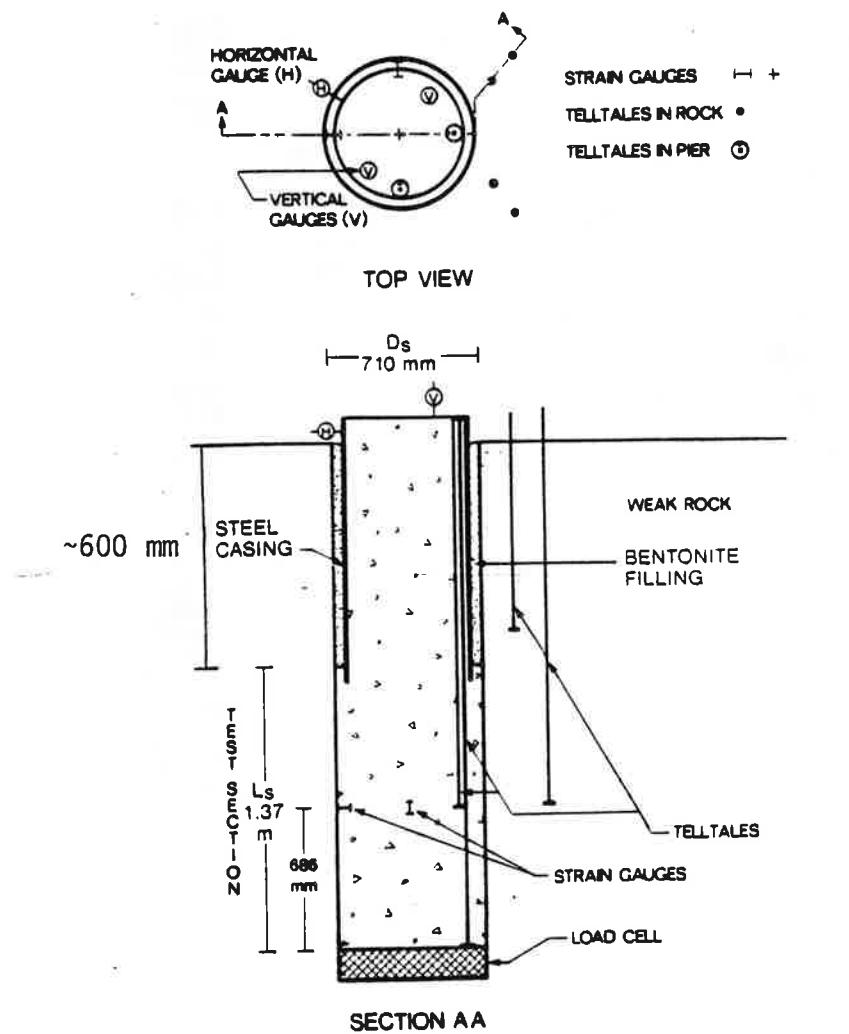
PLAN AND CROSS-SECTION OF GEOMETRY FOR SOCKETED PILES P2 AND P4 (from HORVATH, 1980)
